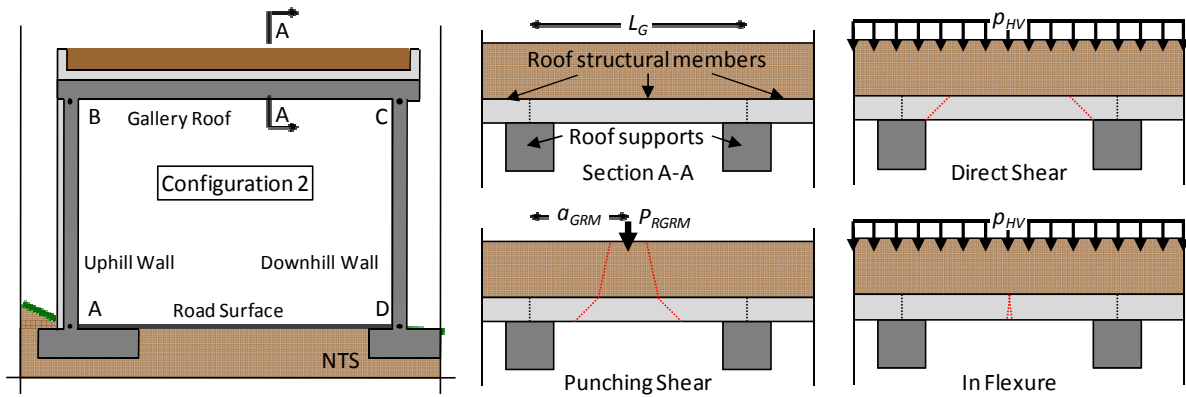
Gallery roof or wall members overloaded in shear or flexure.
